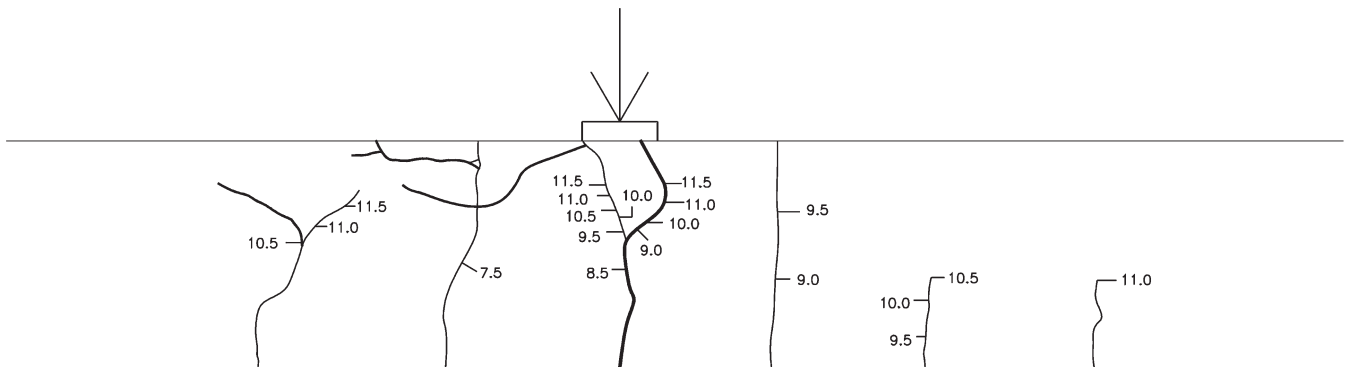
Crack patterns at failure of single-strand development length specimen 3L.
